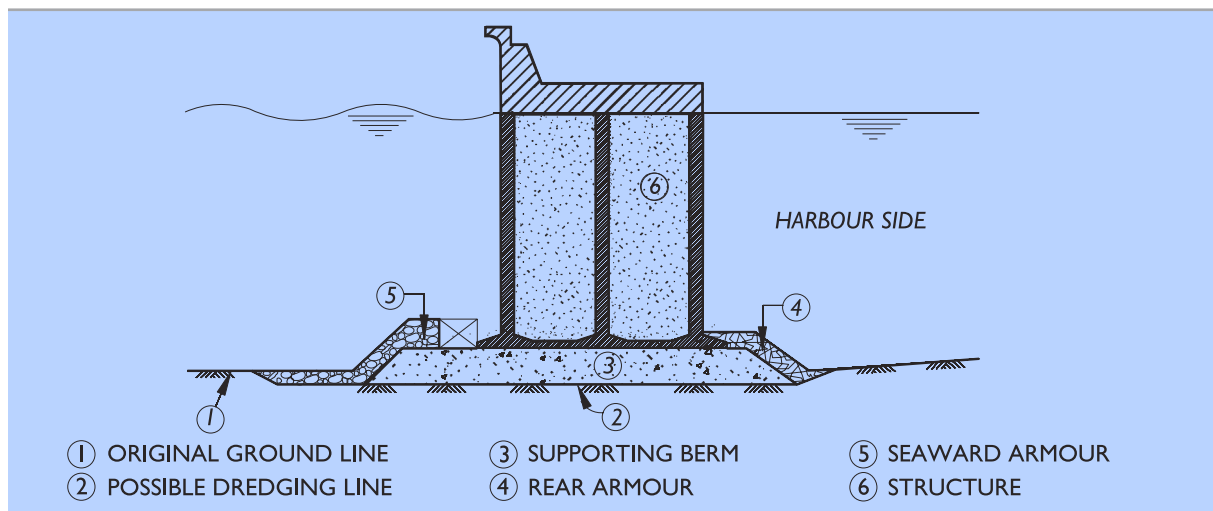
shows a typical cross-section of a breakwater with a vertical face formed by a precast reinforced concrete caisson.
